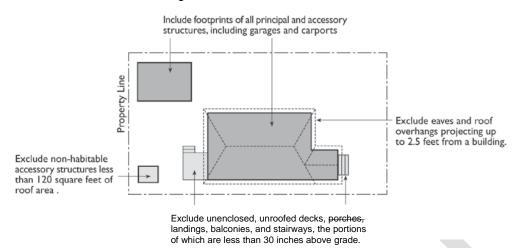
J: DETERMINING LOT-BUILDING COVERAGE
